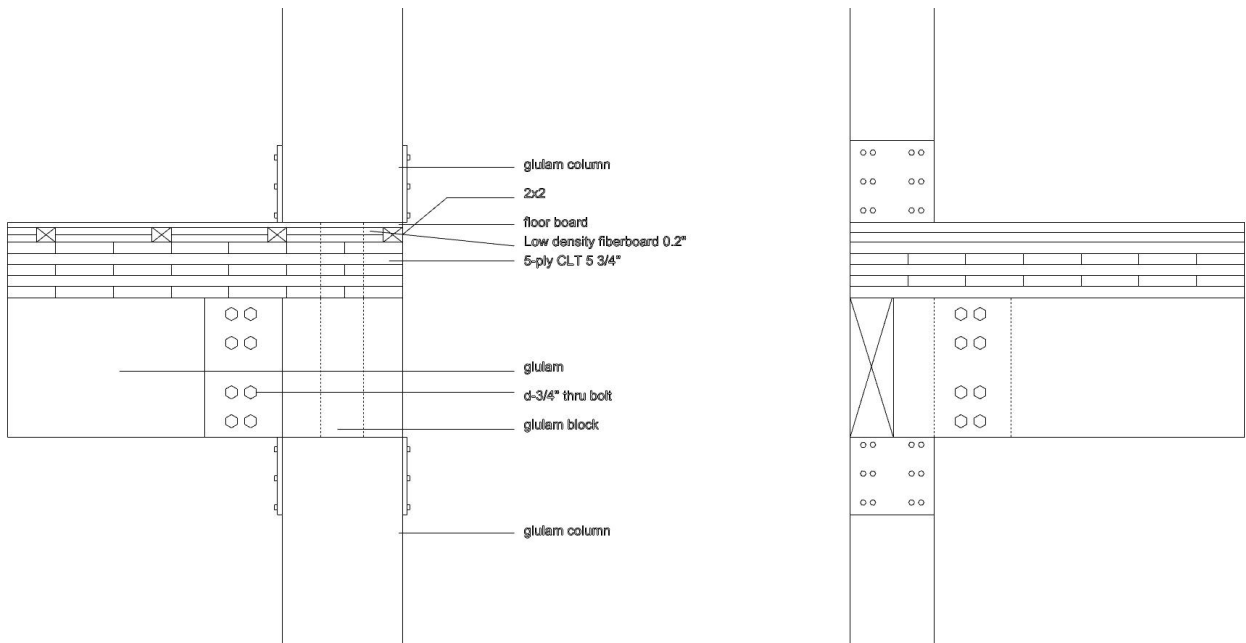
illustrates the glulam beams' connection in facade conditions, such as building edges and corners. The glulam beam is oriented so that it's flush with the building's exterior wall for ease of installation. The glulam column connection remains the same as it is in the typical condition.
